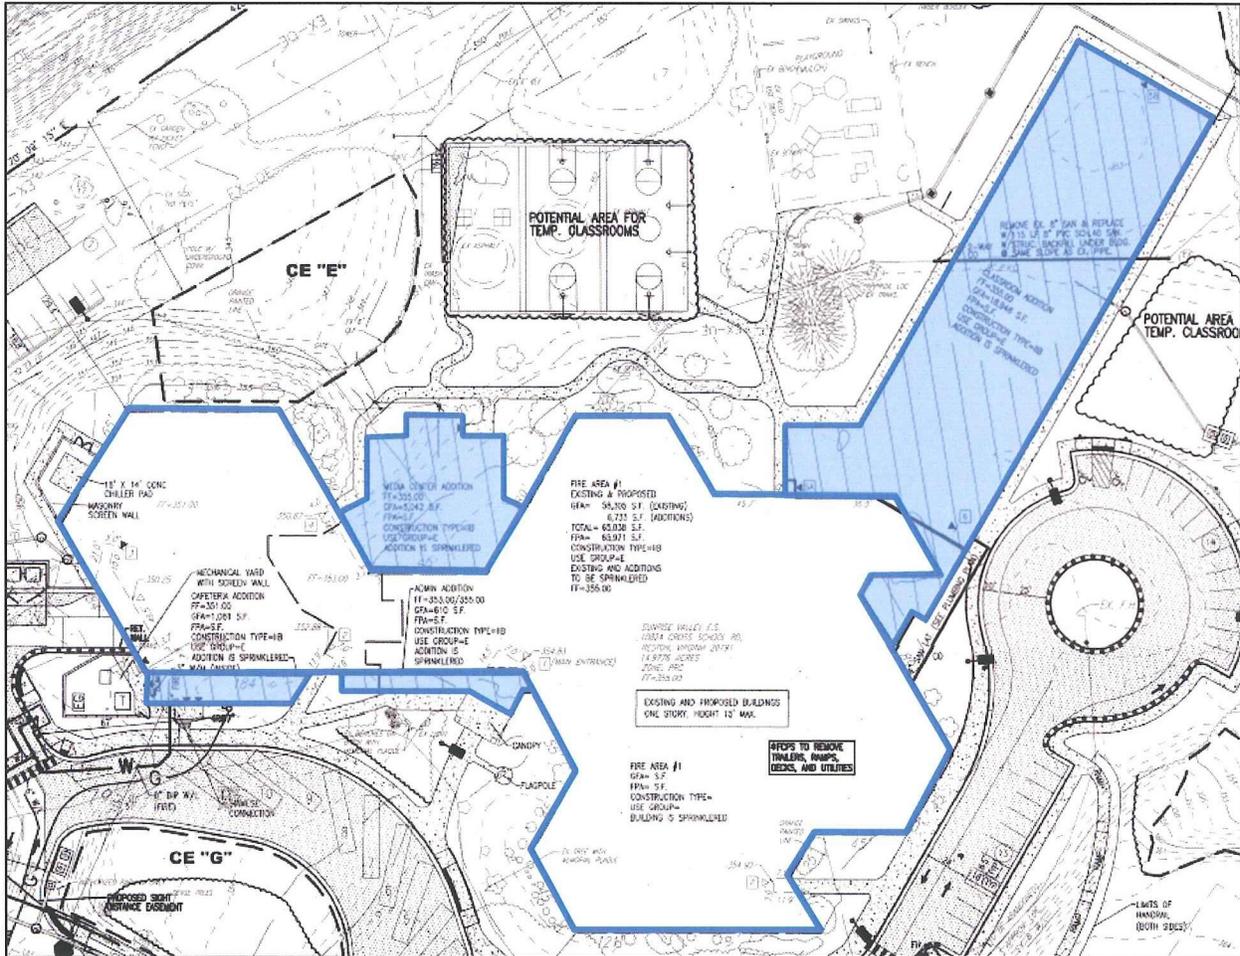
A: The four building additions are shaded blue. The largest addition is to the upper right, which would be 15 new classrooms for the elementary school. (Source – Adtek Engineers, May 4, 2012)
